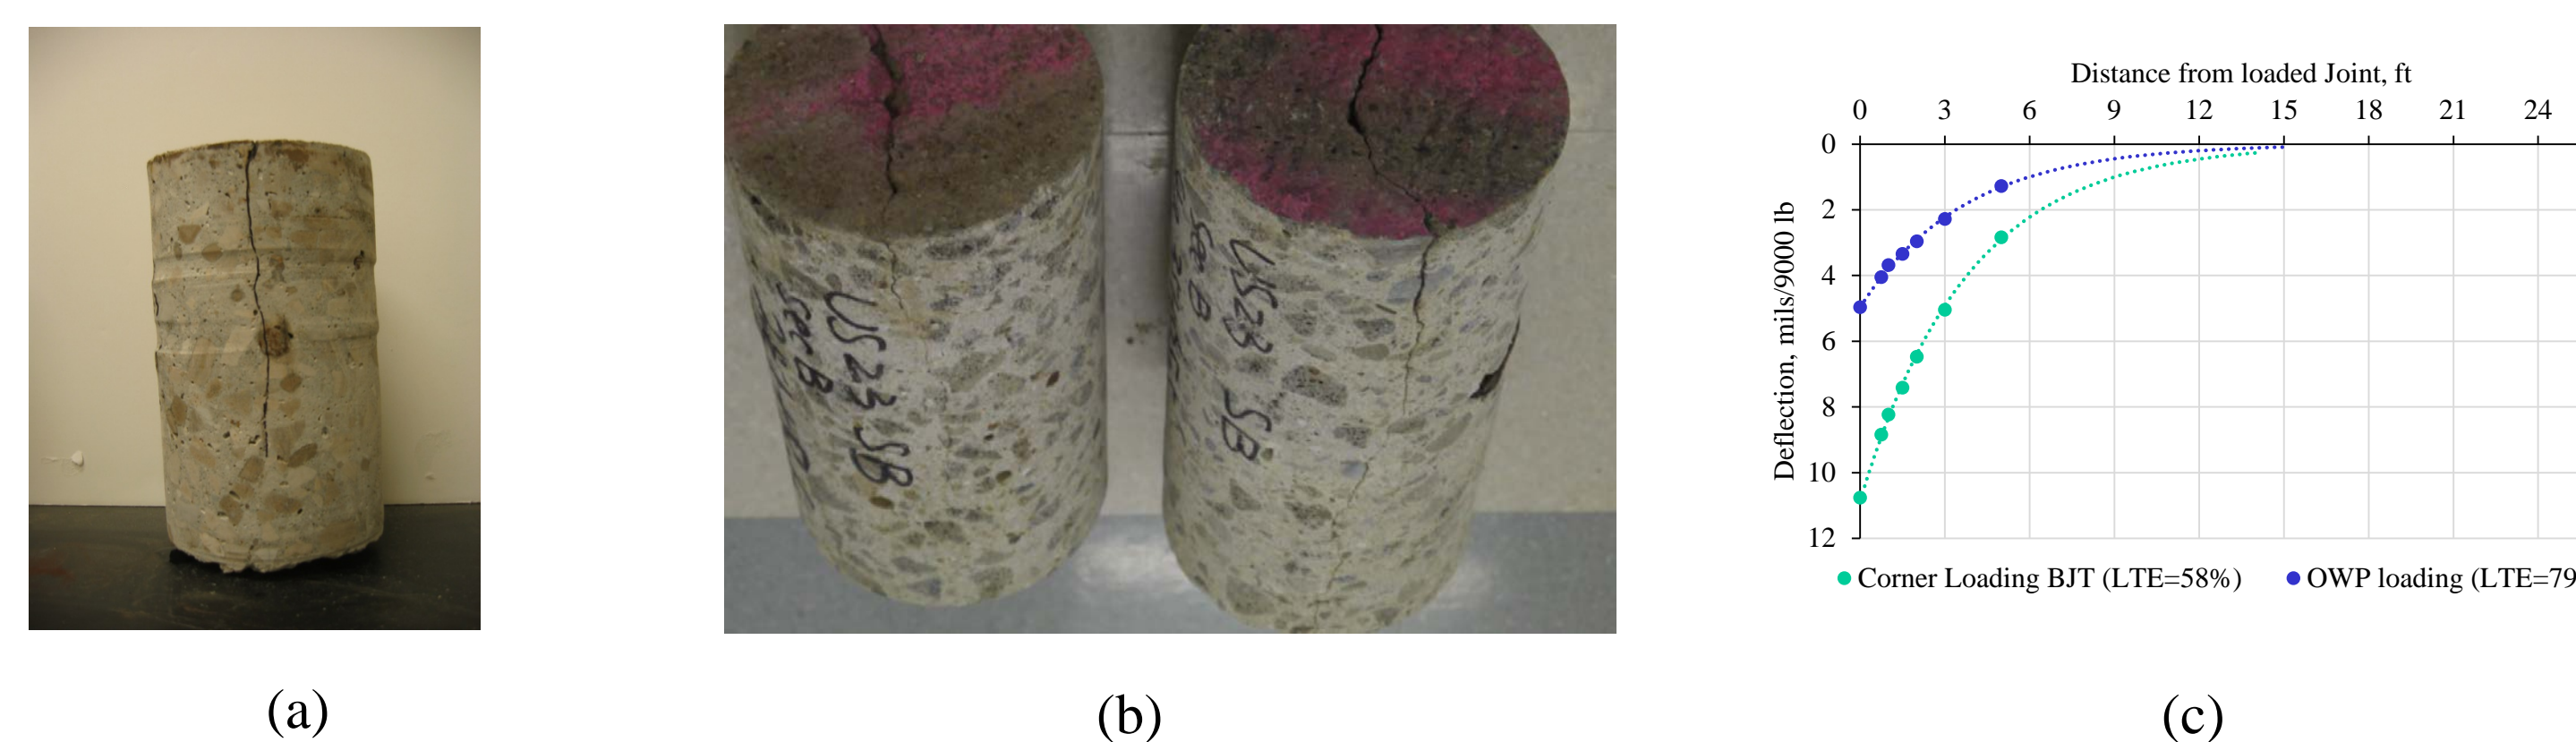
Cores from section A(a) and B(b) illustrating Top-Down mid-slab crack development and (c) slab bending from FWD loading (9000 lb) at joint in Section A (2006)
